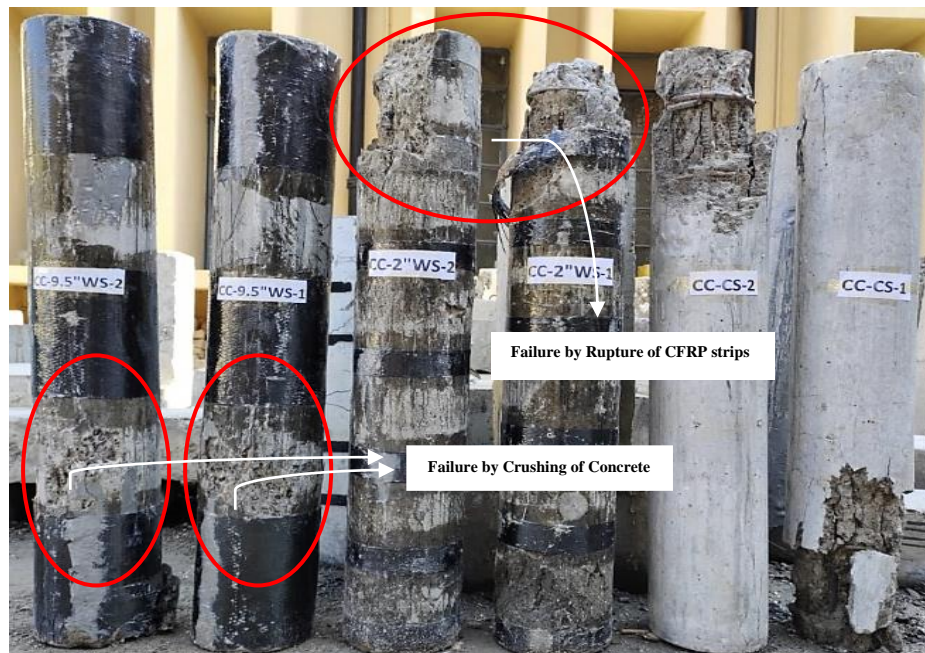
Failure of all control, 2- & 9.5-inches wide strip specimens from right to left
